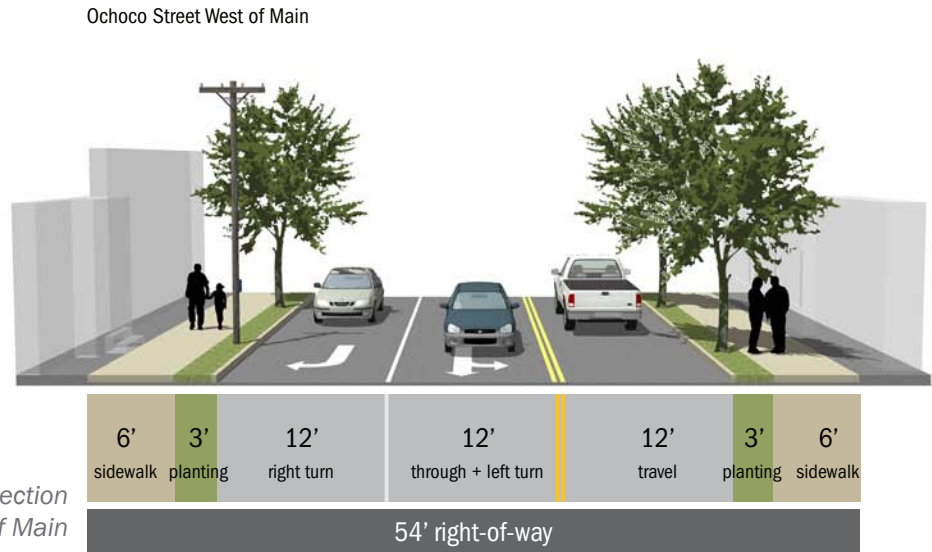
Proposed Conceptual Cross-Section for Ochoco Street West of Main
